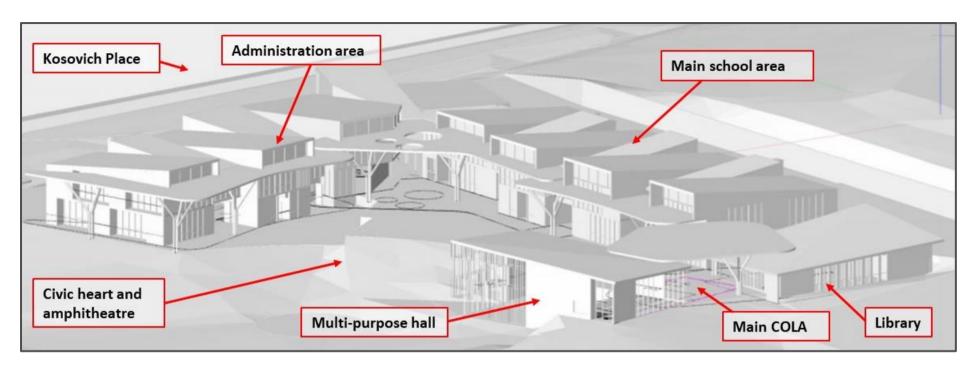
| Building massing, view from south west of site (Source: Applicant's EIS 2018)
